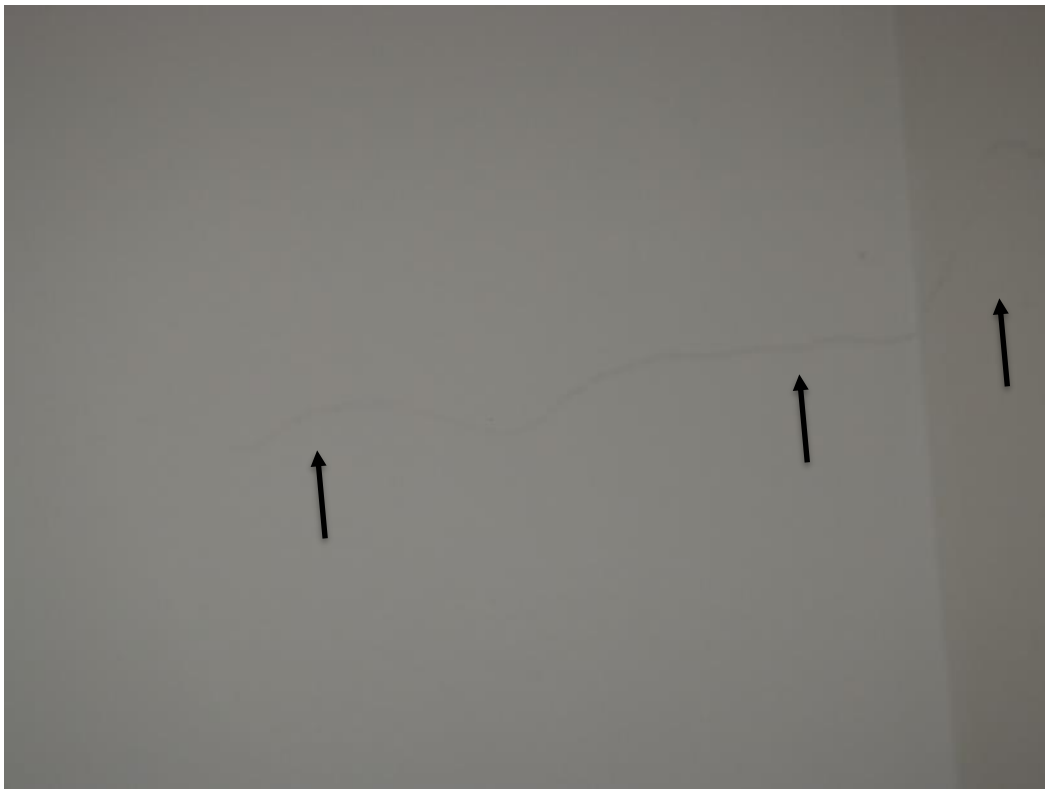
shows separation cracking to the cornice / cupboard junction in the north-eastern corner of Bedroom 3.
